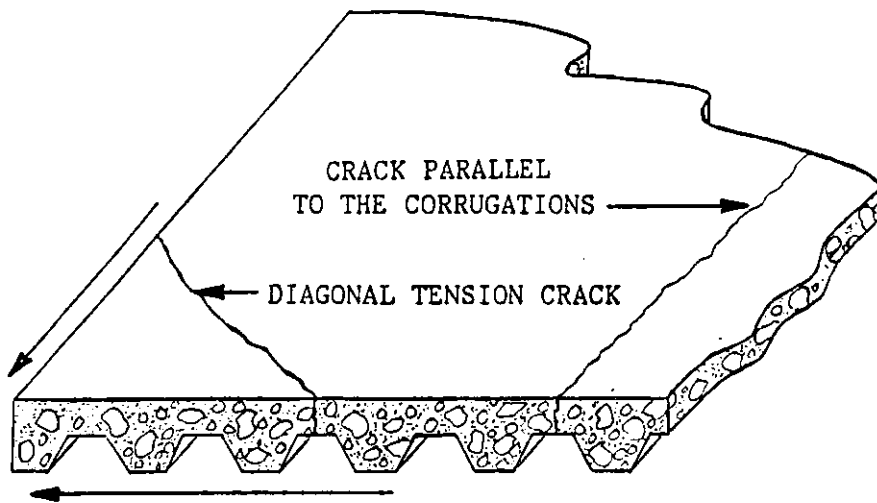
Shear failure of the concrete in diagonal tension and cracks parallel to the corrugations
